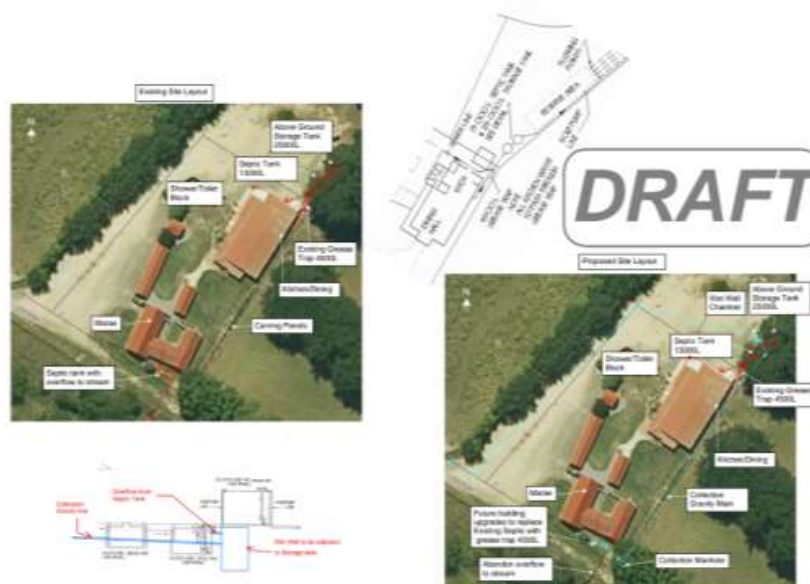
Proposed wastewater layouts at Rongomaraeroa Marae
